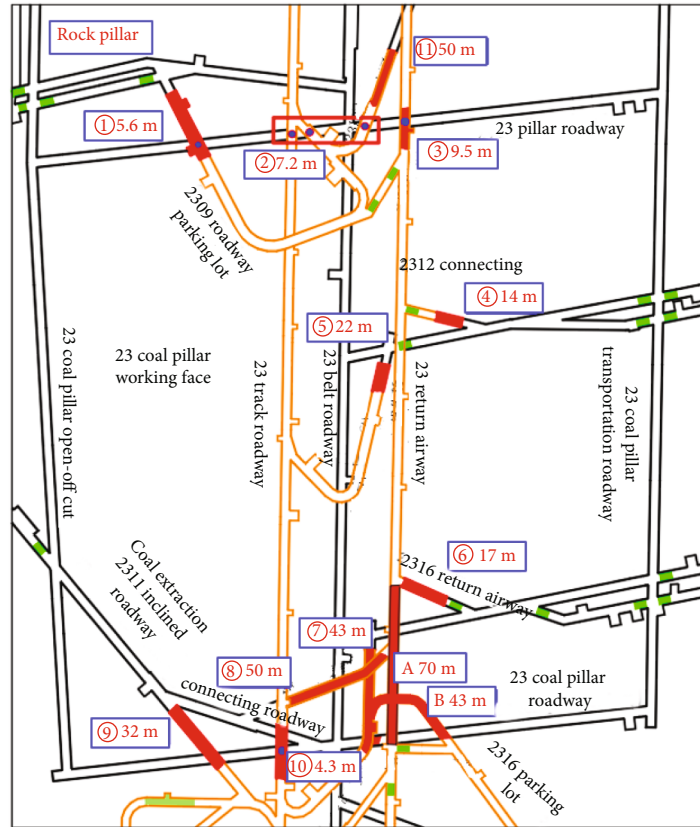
Positions requiring to be reinforced when the working face passes through the roof abandoned roadway.
